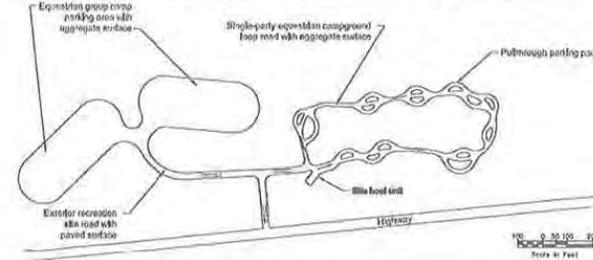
Pavement should not be used in equestrian areas. Paving the exterior recreation site road is an exception to this rule because stock seldom travel there.
